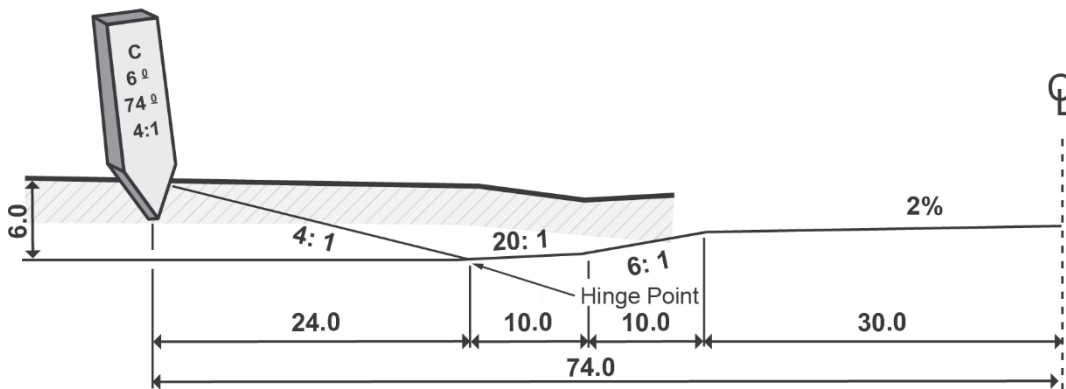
Slope stake for cut section - flat-bottom ditch
